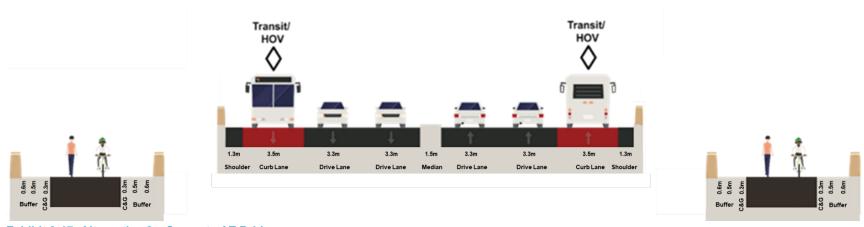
Alternative 2 - Separate AT Bridges
